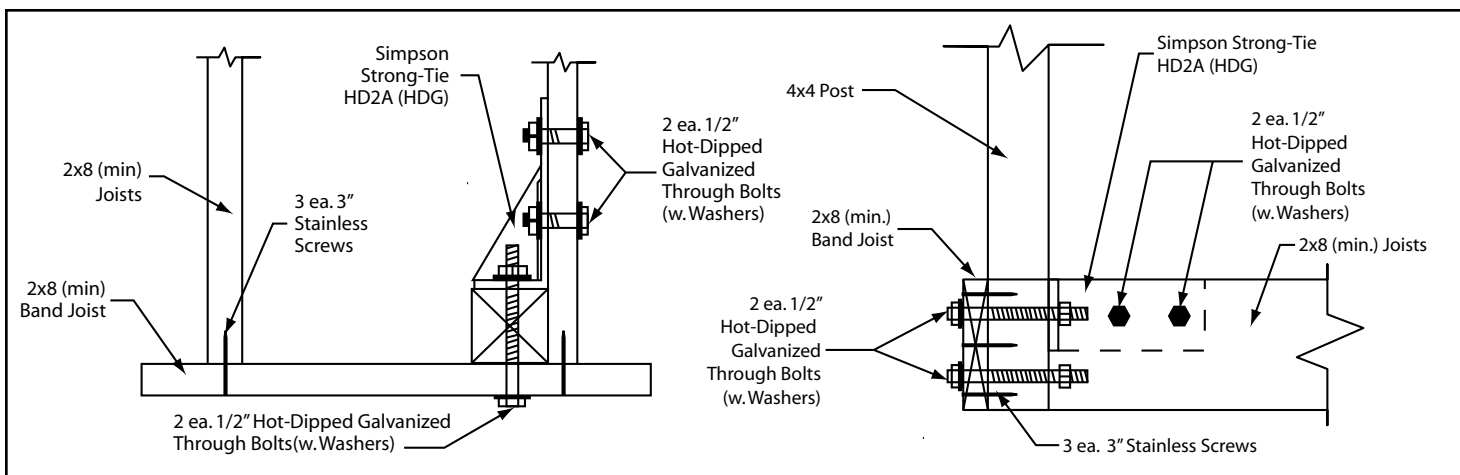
Guardrail post test assembly details for 4x4 southern pine posts inside of band joist.
